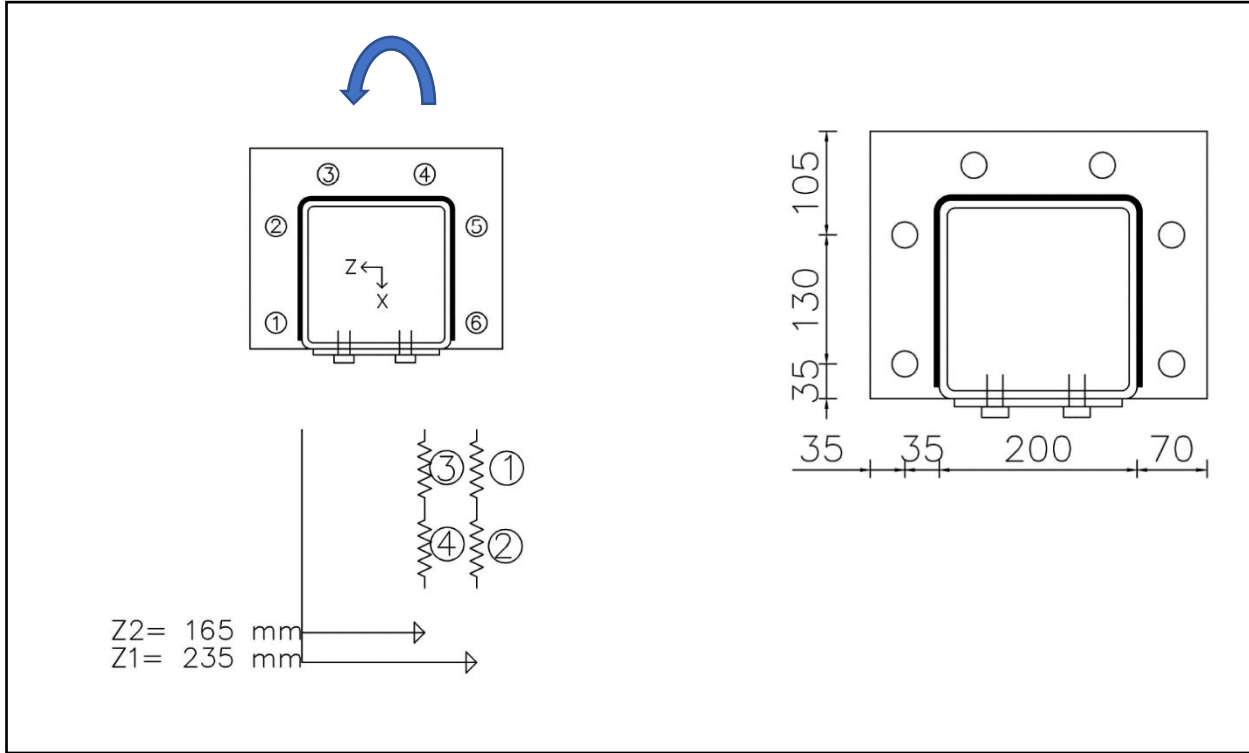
Plan and elevation of specimen IC-1 (case 3)
